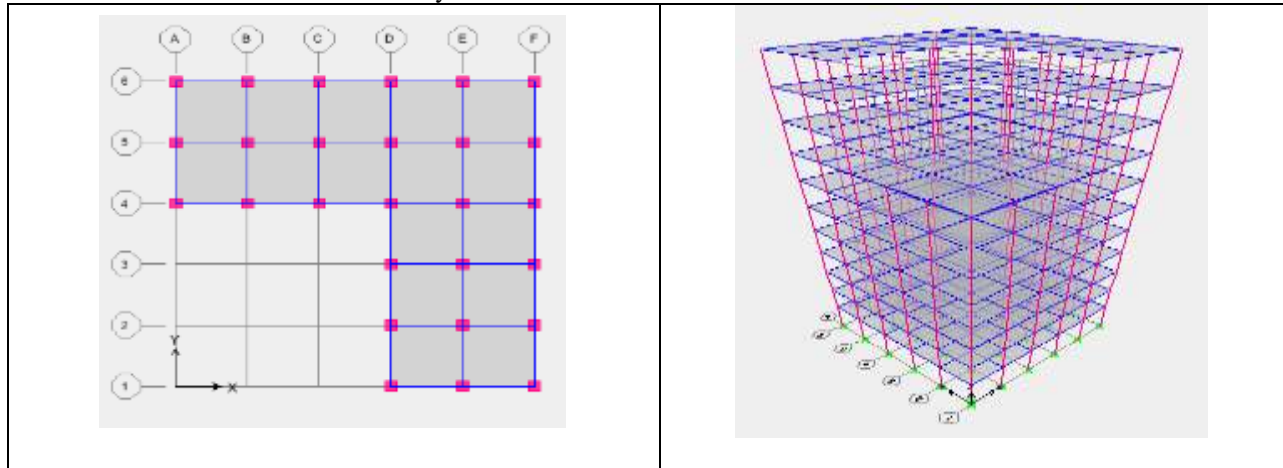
Plan Layout and 3D view of Asymmetric building Model-1
